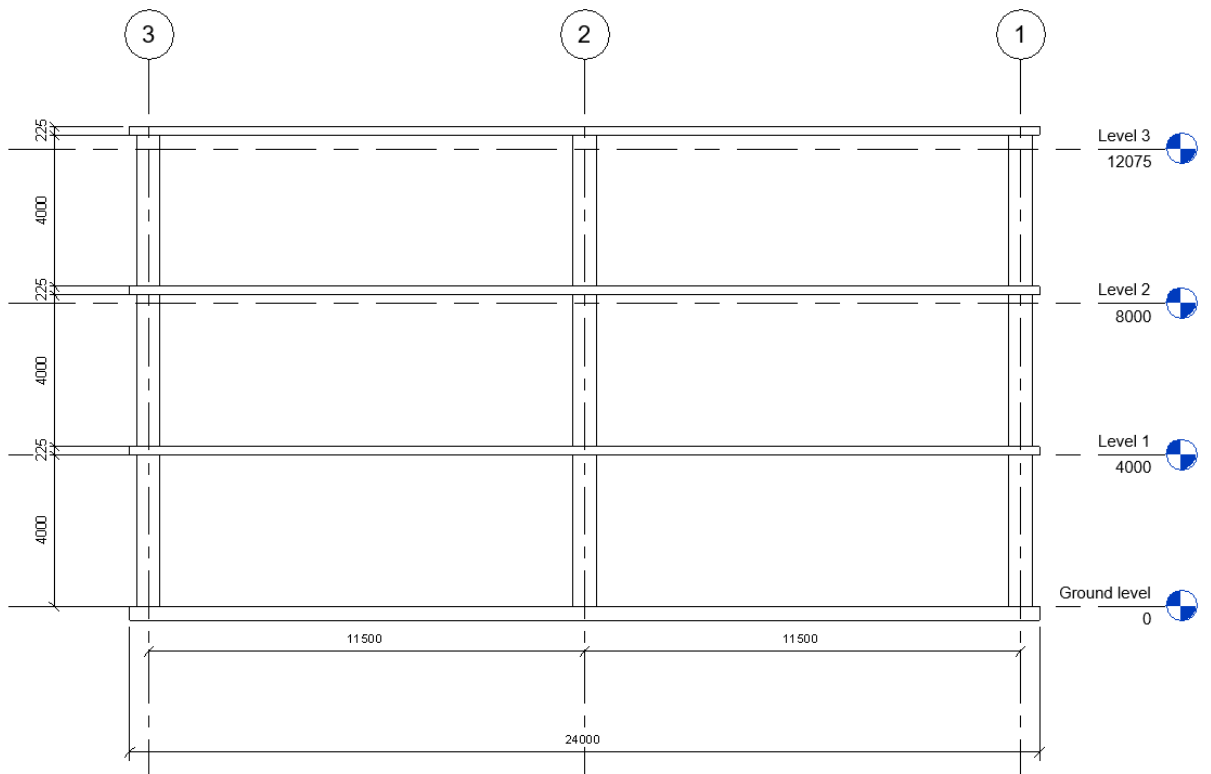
Side view of building modelled in Revit 2024. View direction from North
